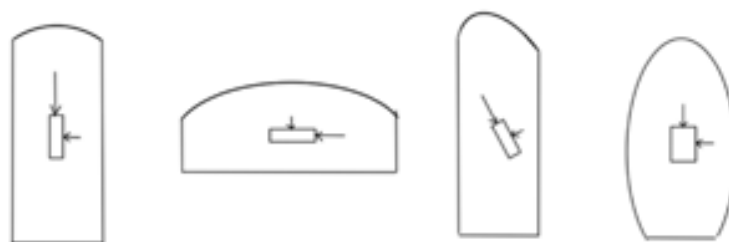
Optimum shape of cavern cross section depending on the orientation of the major stresses(Norwegian Tunnelling Society, 2016)
